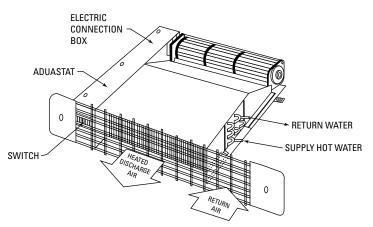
Kickspace heater. (Courtesy Beacon/Morris)
